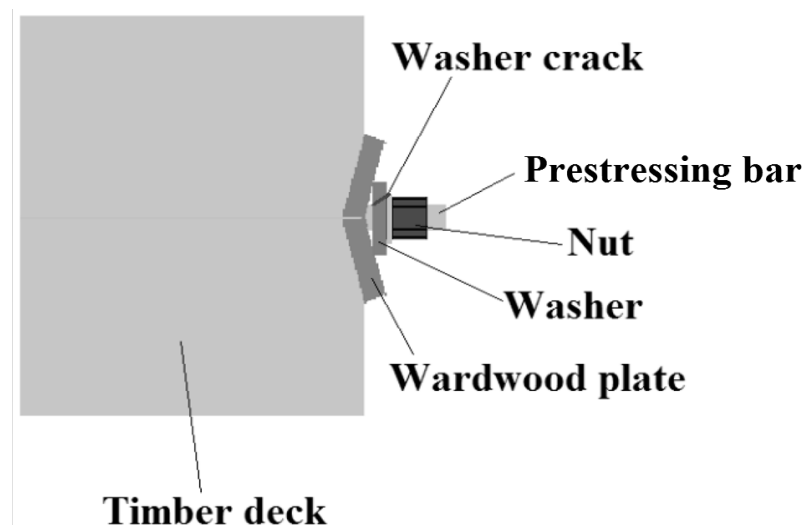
Example of the cracking mechanism of the washer plate in a prestressing bar anchorage
